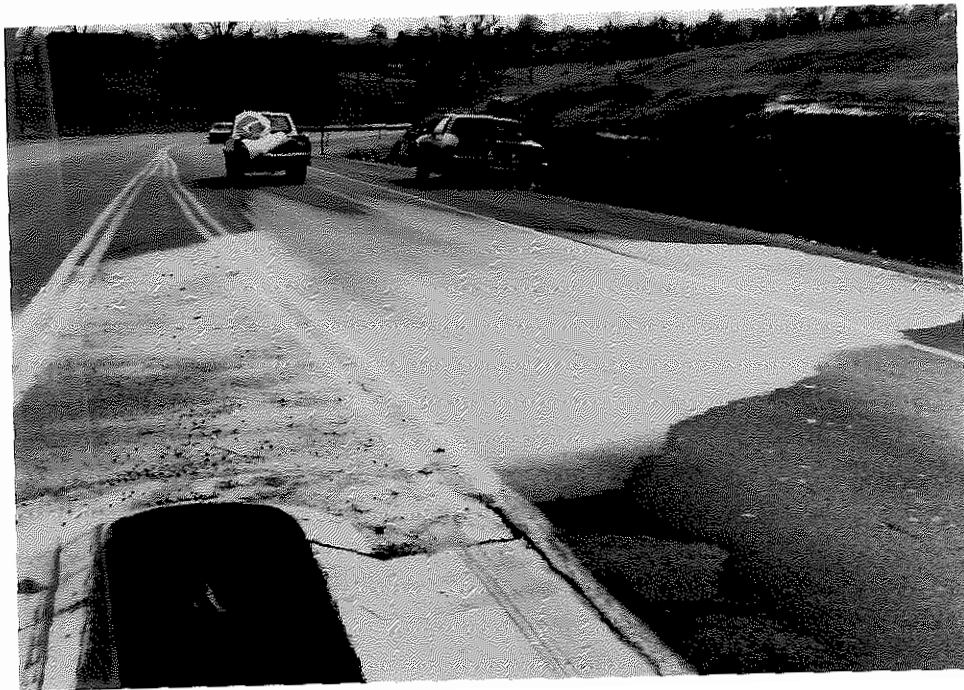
Water Emerging at Joint between Pavement and Gutter.
